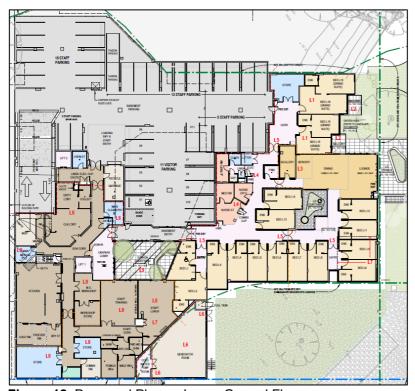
Proposed Plans – Lower Ground Floor *Source: Morrison Design Partnership Pty Ltd
